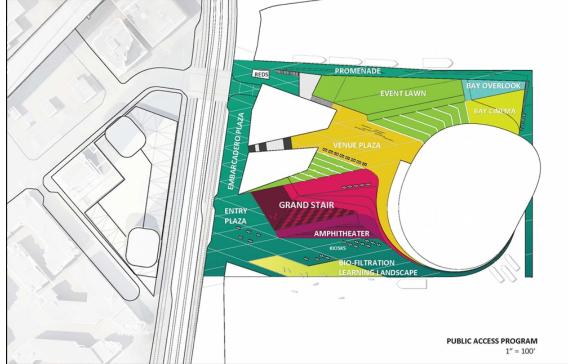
Illustration of Proposed Development of Pier 30-32, with Seawall Lot 330 Outline
